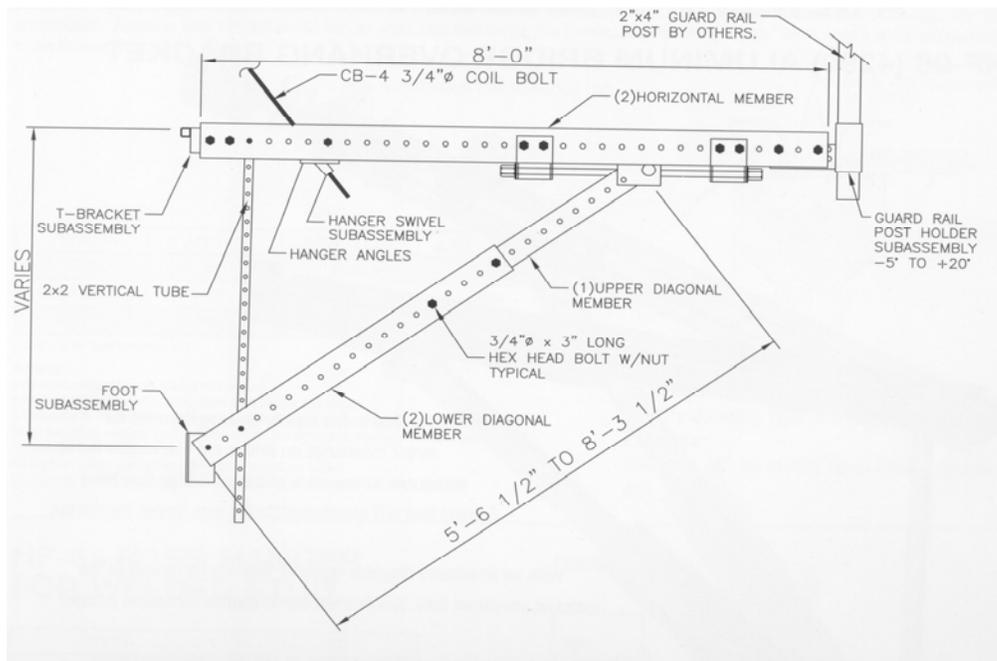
HF-96 Dimension drawing (Meadow Burke Road & Bridge Catalog, 2006)
